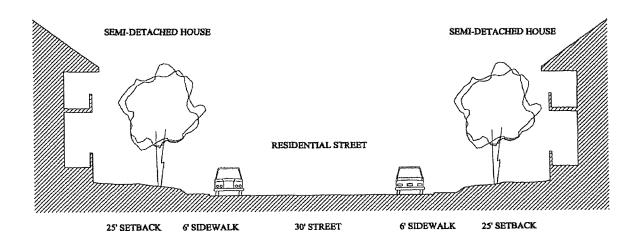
Section Through Residential Street of the Beaches Neighborhood in Toronto, Canada.
